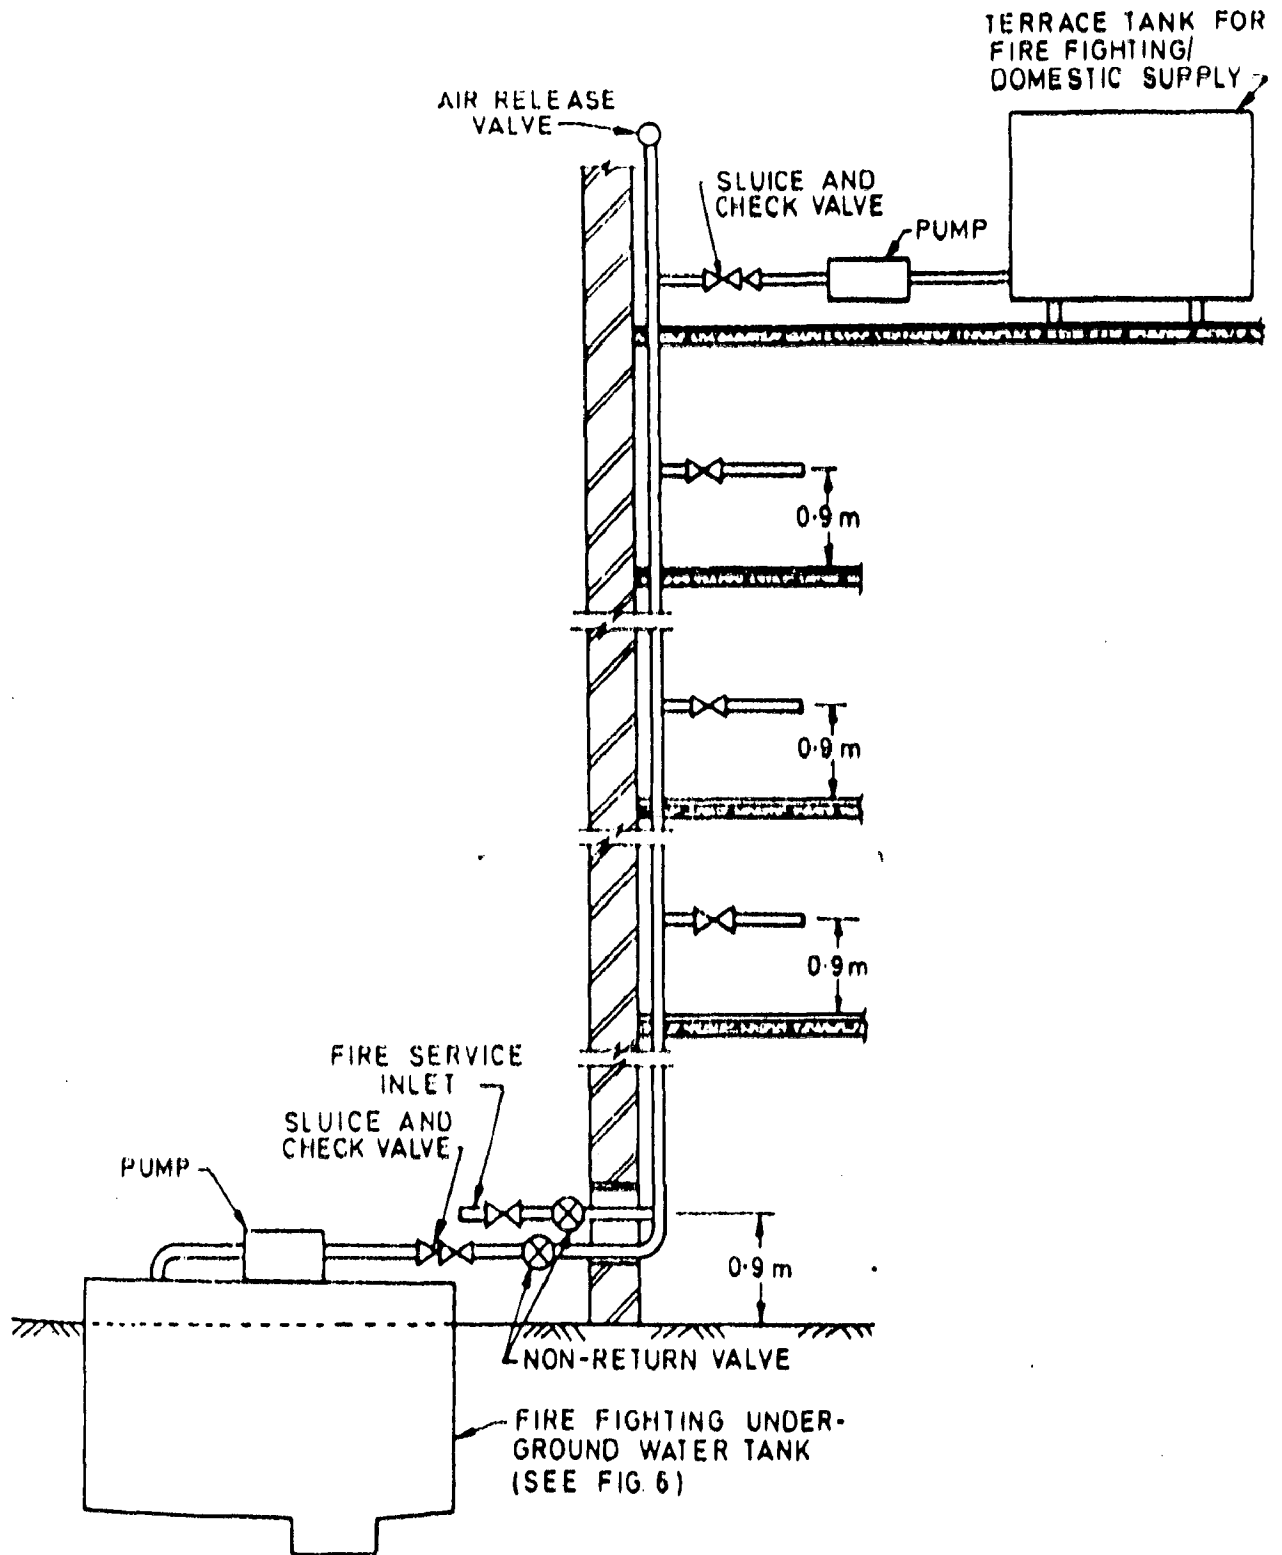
Typical Arrangement of Wet Riser-cum-Downcomer for Apartment Houses Exceeding 24 m in Height
